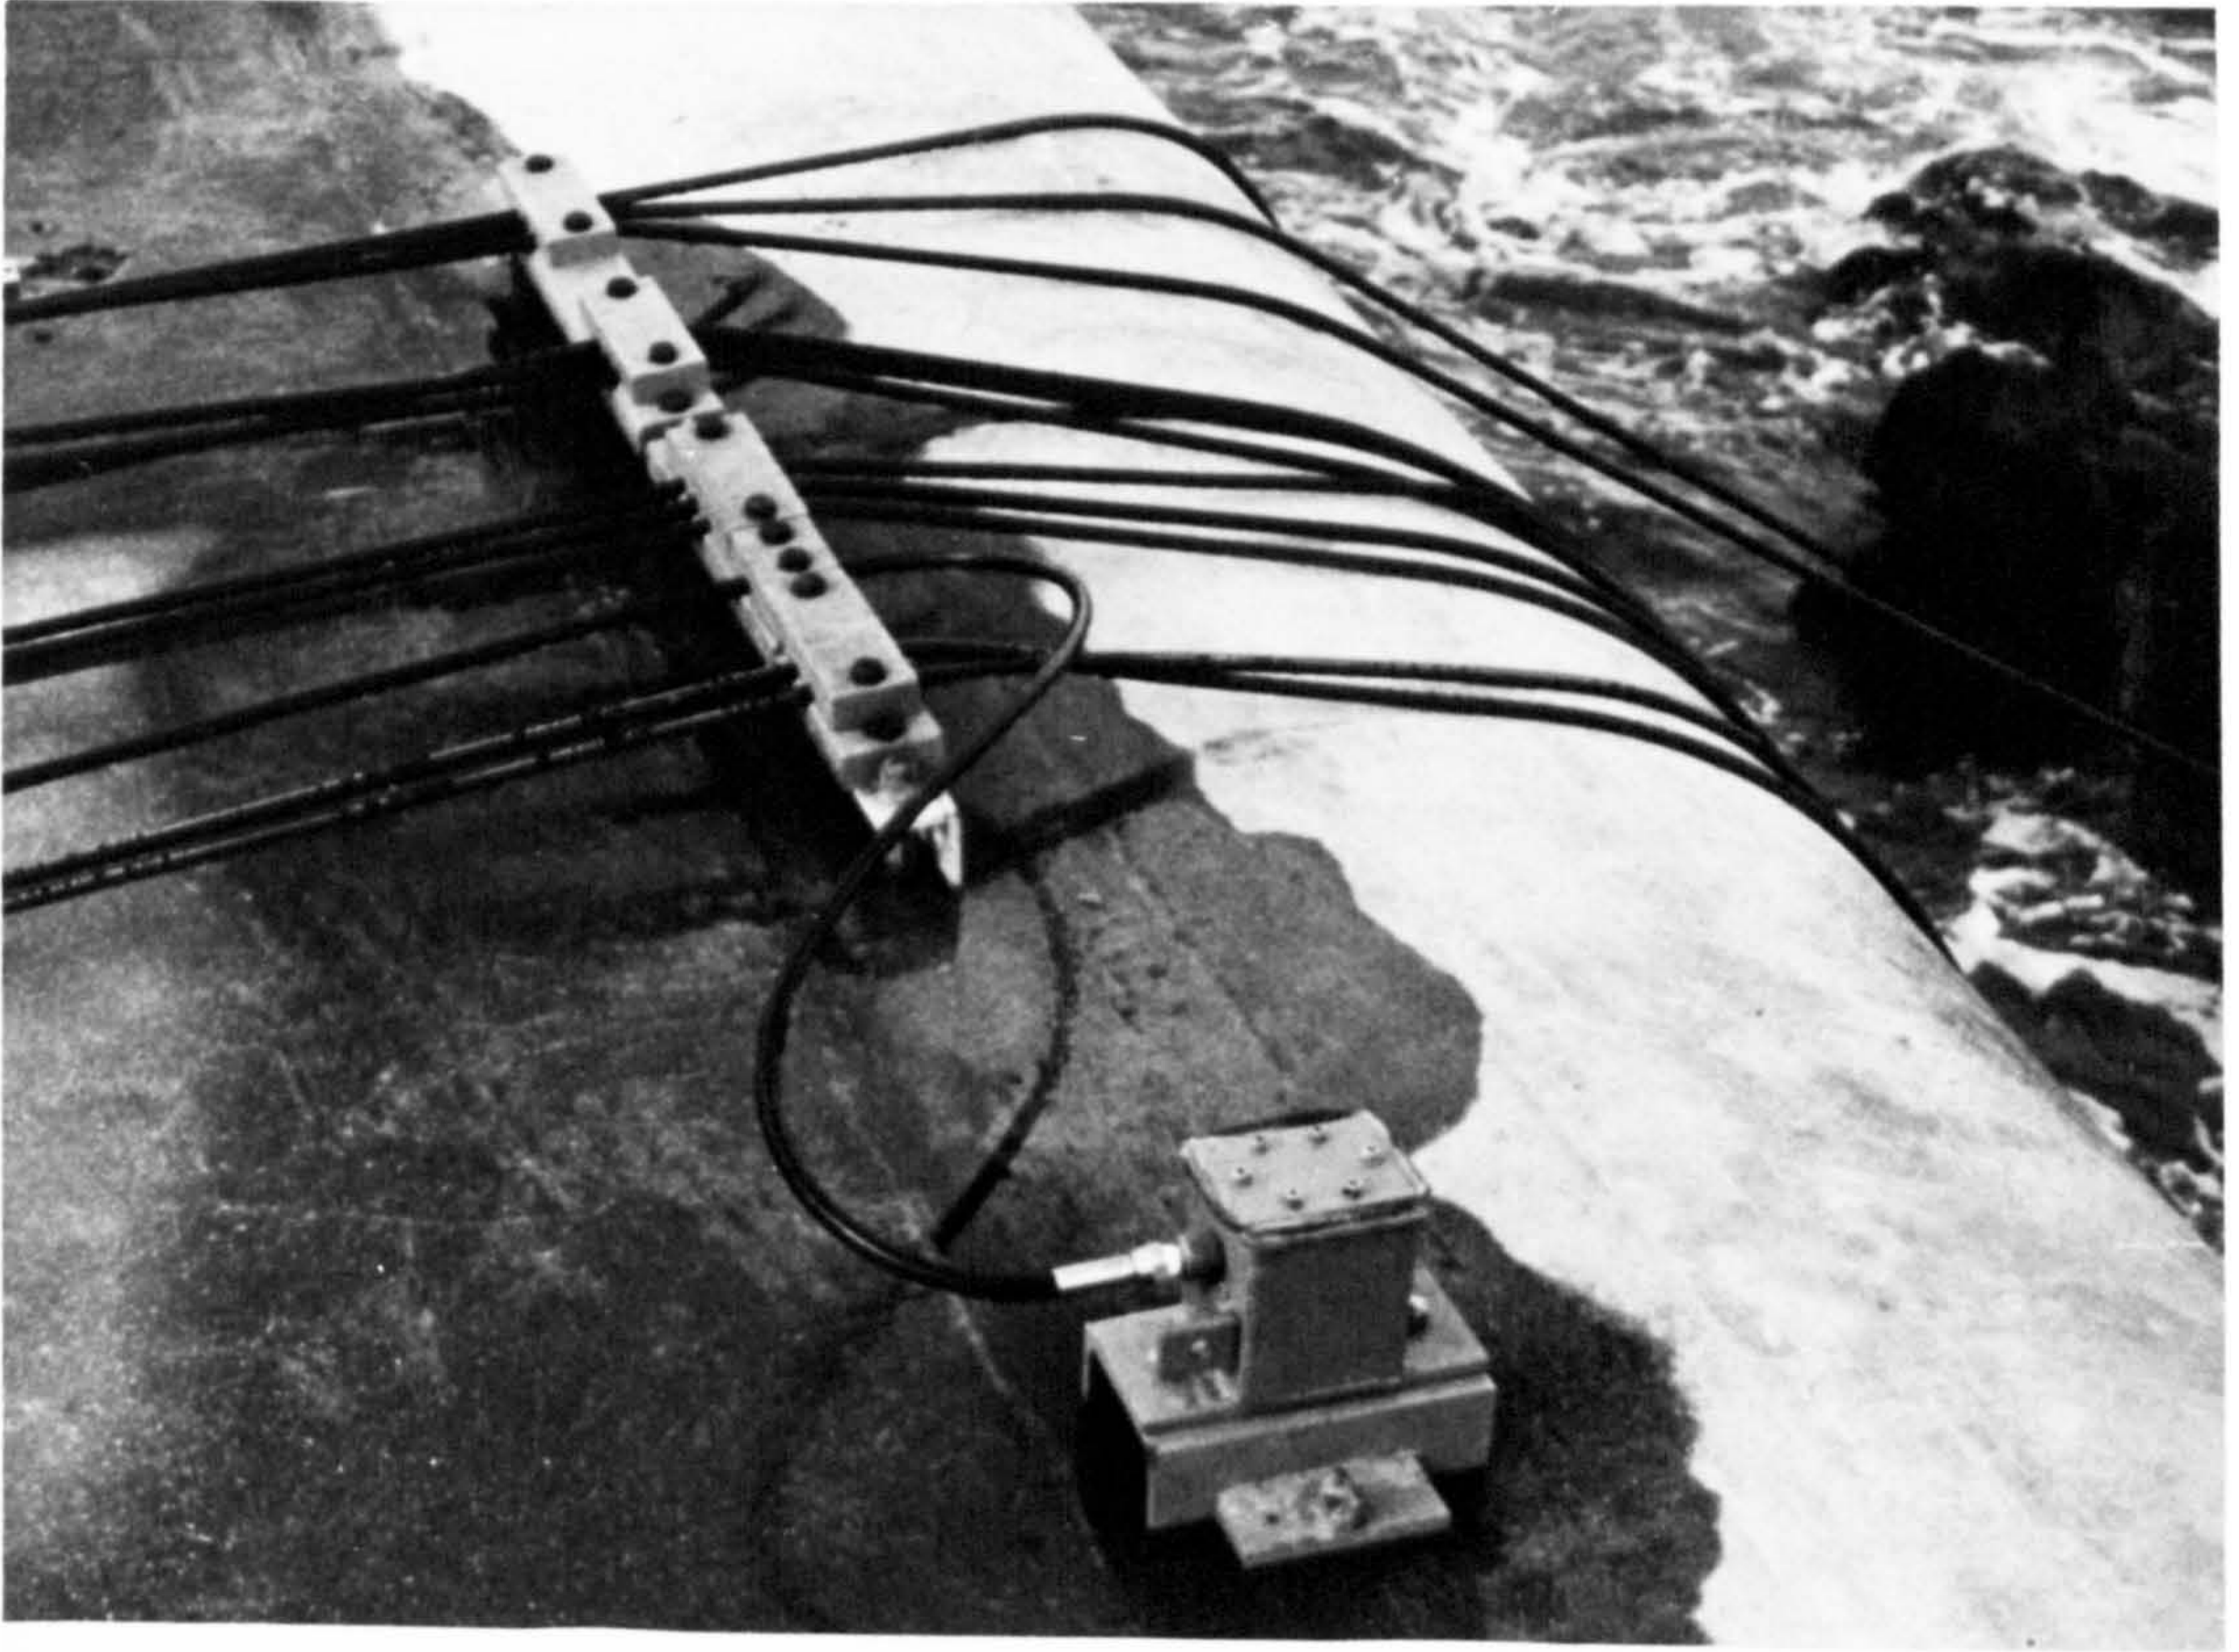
PLATE IV DETAIL OF CLAMPING OF CABLES ON TOP OF WALL
